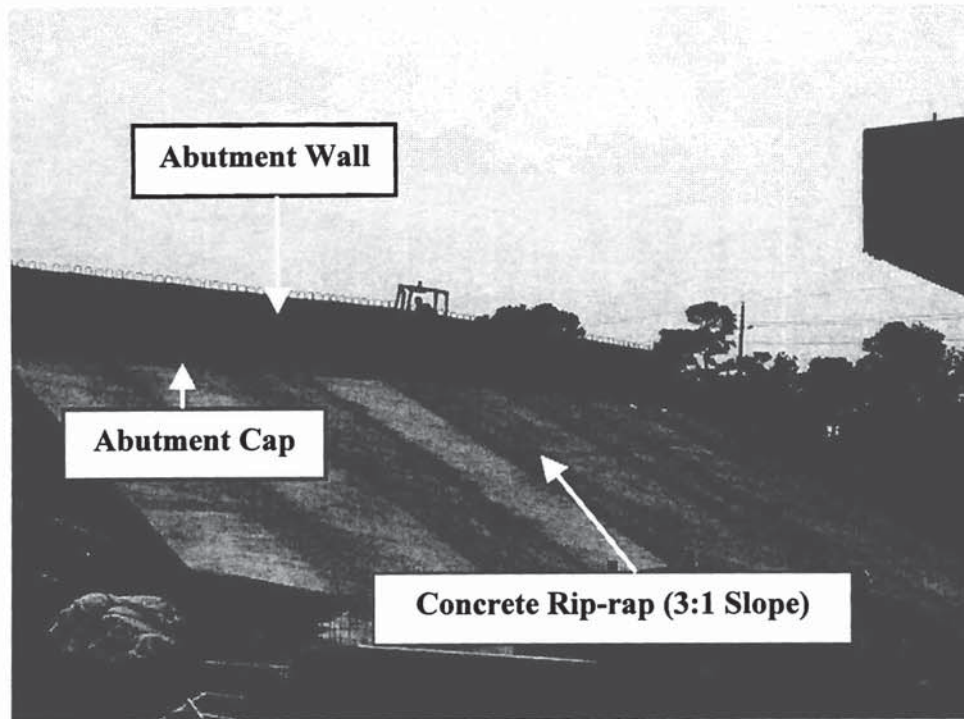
Completed Abutment (Cap and Wall) at Krenek Road Bridge Site
